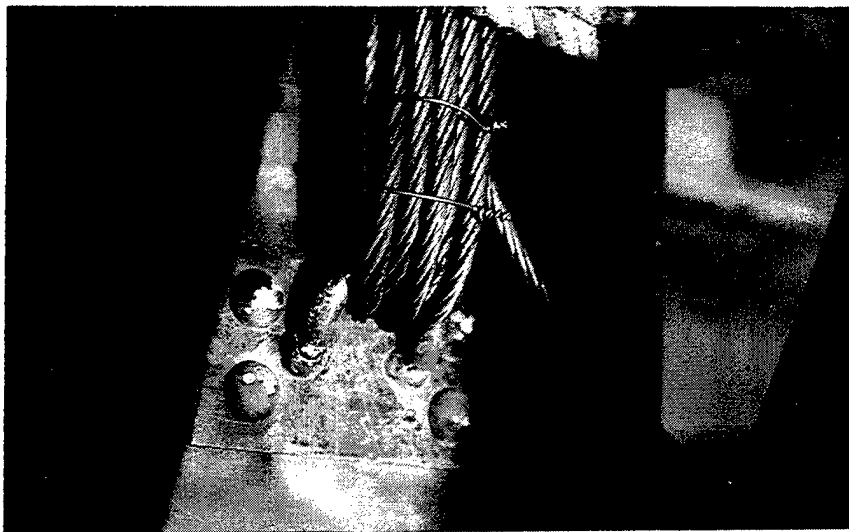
A view of the tie-down device after the pull test to show the mode of the failure of the U-shaped bar by bending and cracking at the welded joints.
